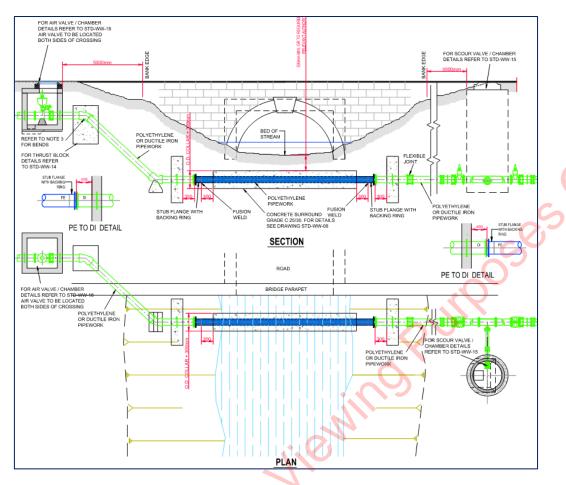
Typical Detail of Rising Main Crossing at Bridge
